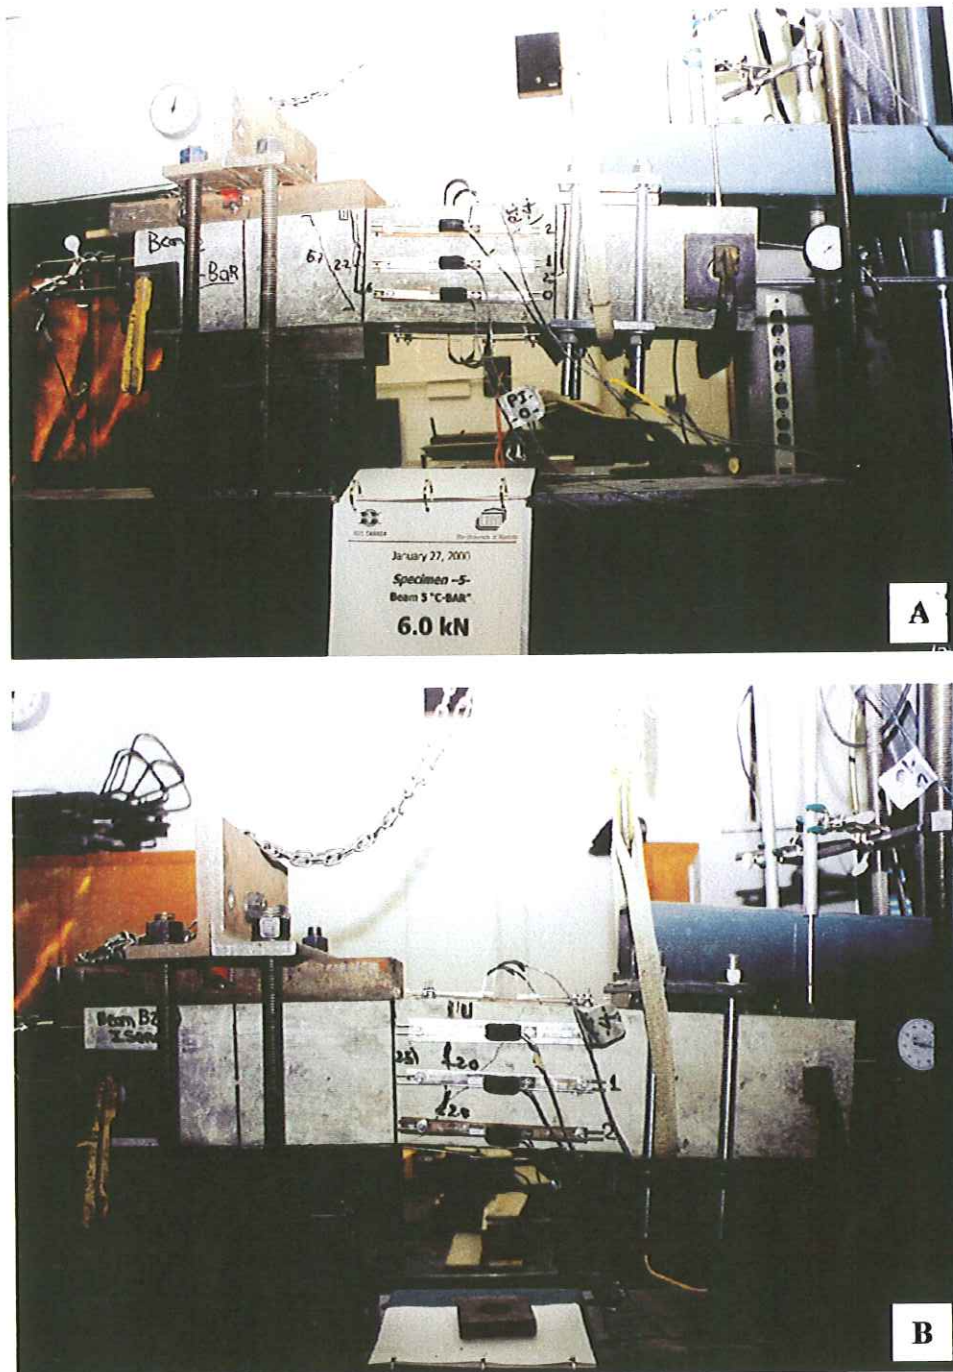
Crack pattern and load - deflection behavior in concrete beams before failure.
